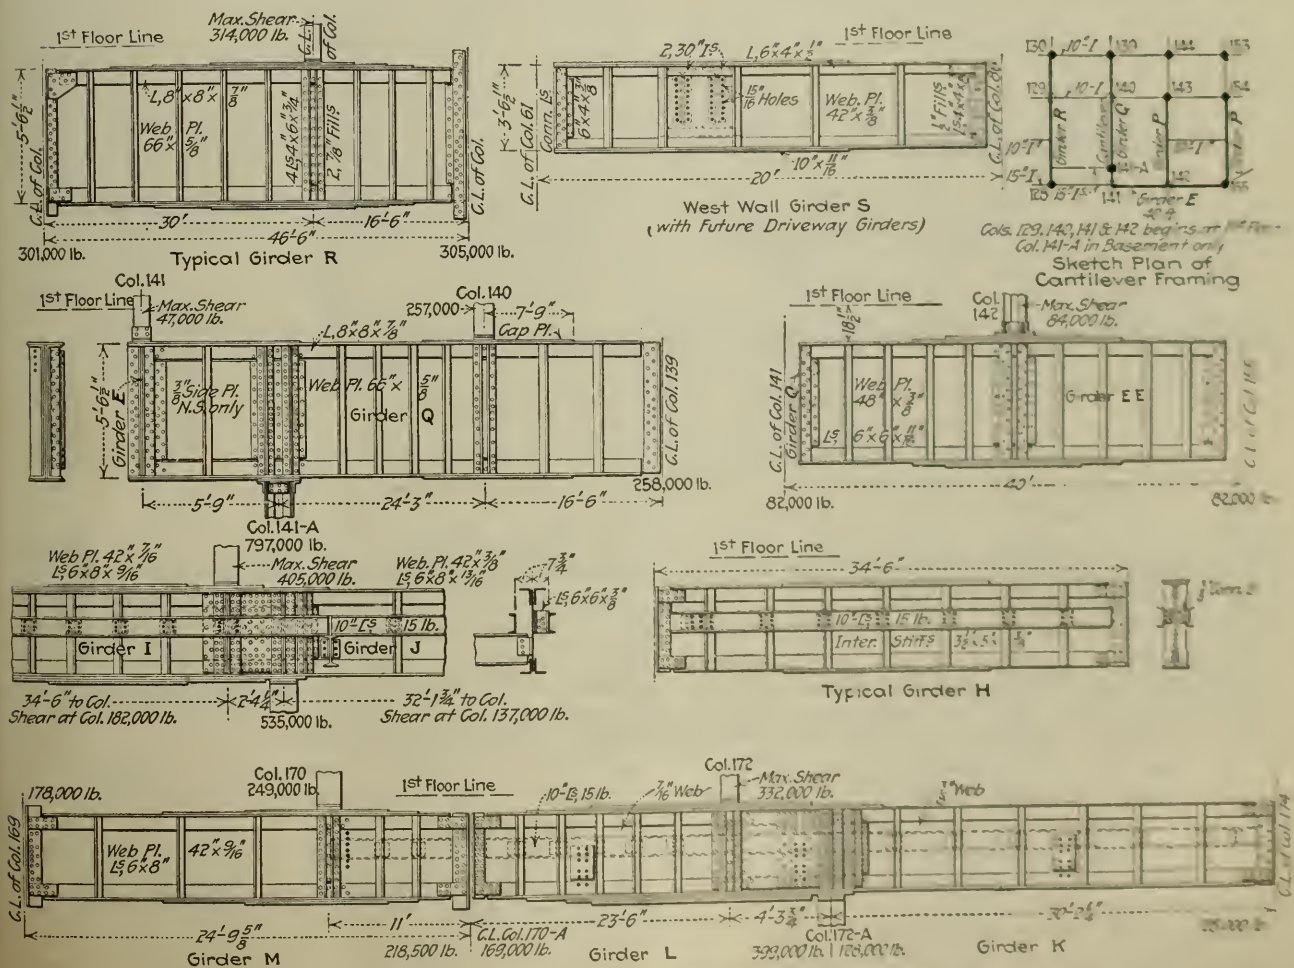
SPECIAL AND TYPICAL GIRDERS OF FLOOR SYSTEM
